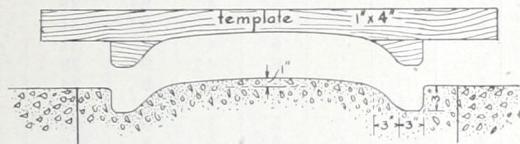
Type of Open Drain and Template for Forming the Gutter.
